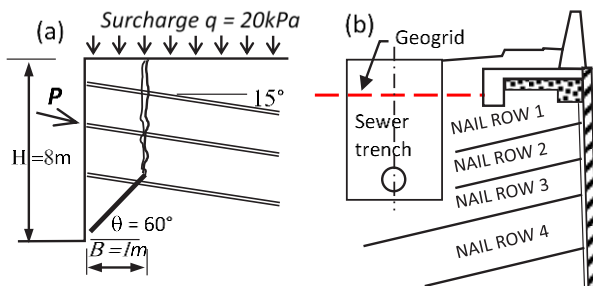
(a) Wedge failure mechanism (b) Design of soil nail wall near existing sewer trench
